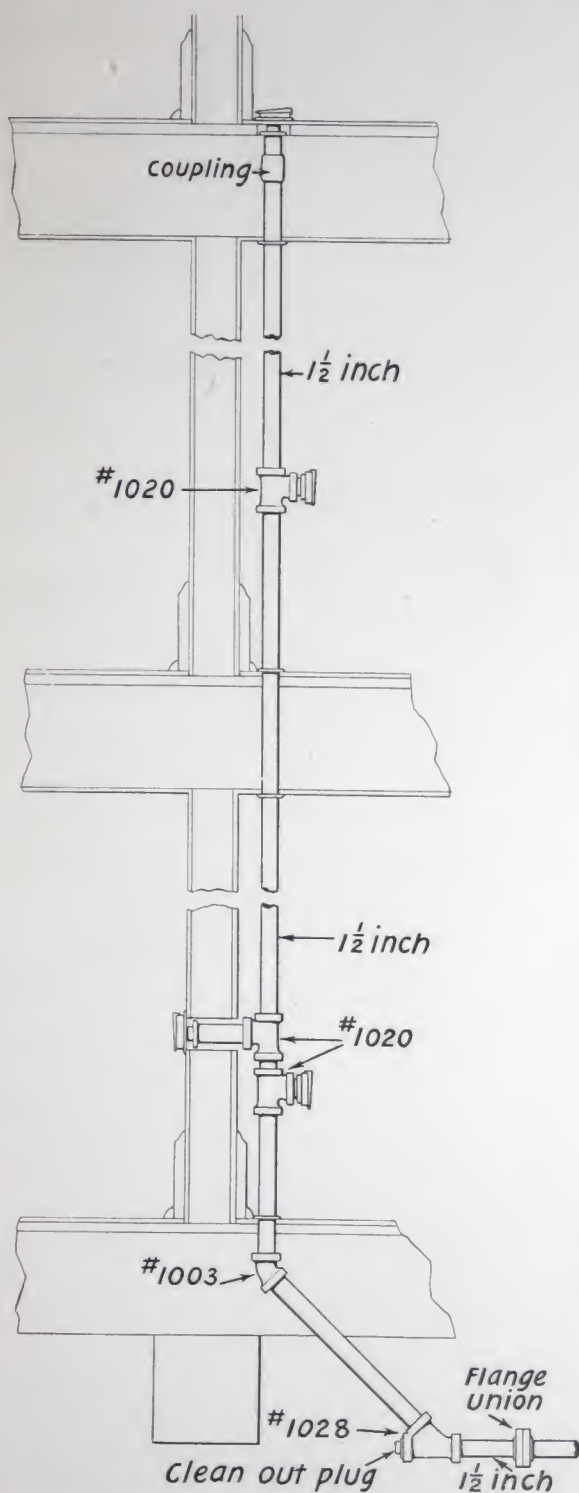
Typical riser, exposed in rooms, with two inlet couplings in first story, one inlet coupling in second story, and one inlet coupling in floor of third story.
